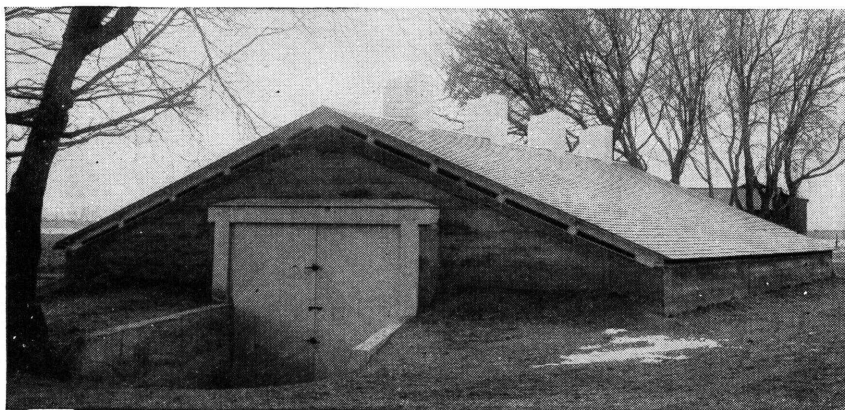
Earth-covered storage with shingle roof built over the original earth cover.
